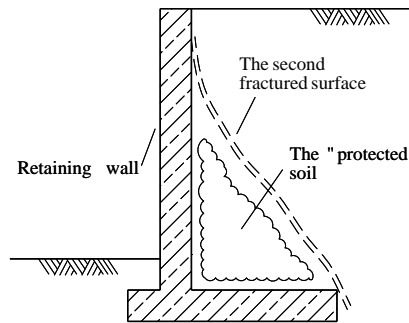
Part of filling apart from fractured surface in cantilever retaining wall
